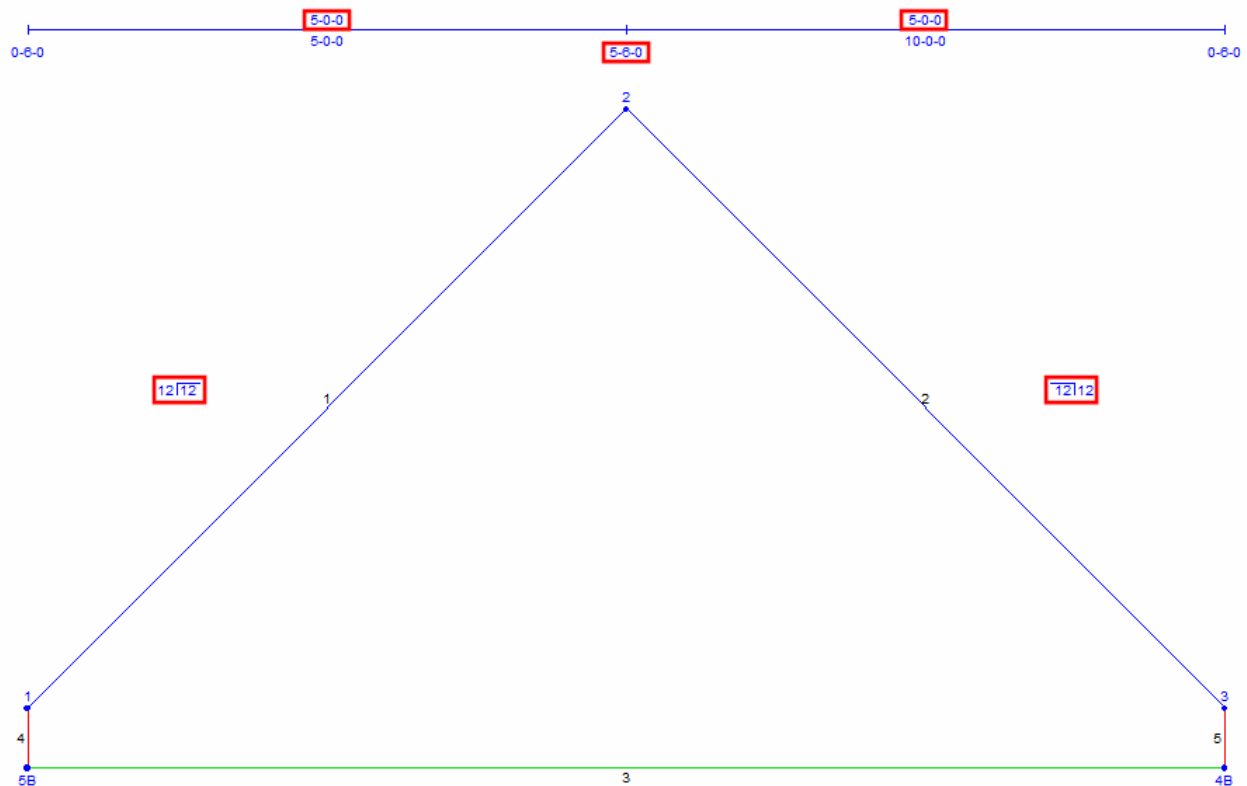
With a new slope of 12/12 defined for member 1 *AND* the Horizontal Dimension held constant, the span of truss members 1 and 2 has not changed, however, the overall height of the revised truss is now 2' 6" greater than the original, and the slope of truss member 2 has changed to 12/12 as well.
